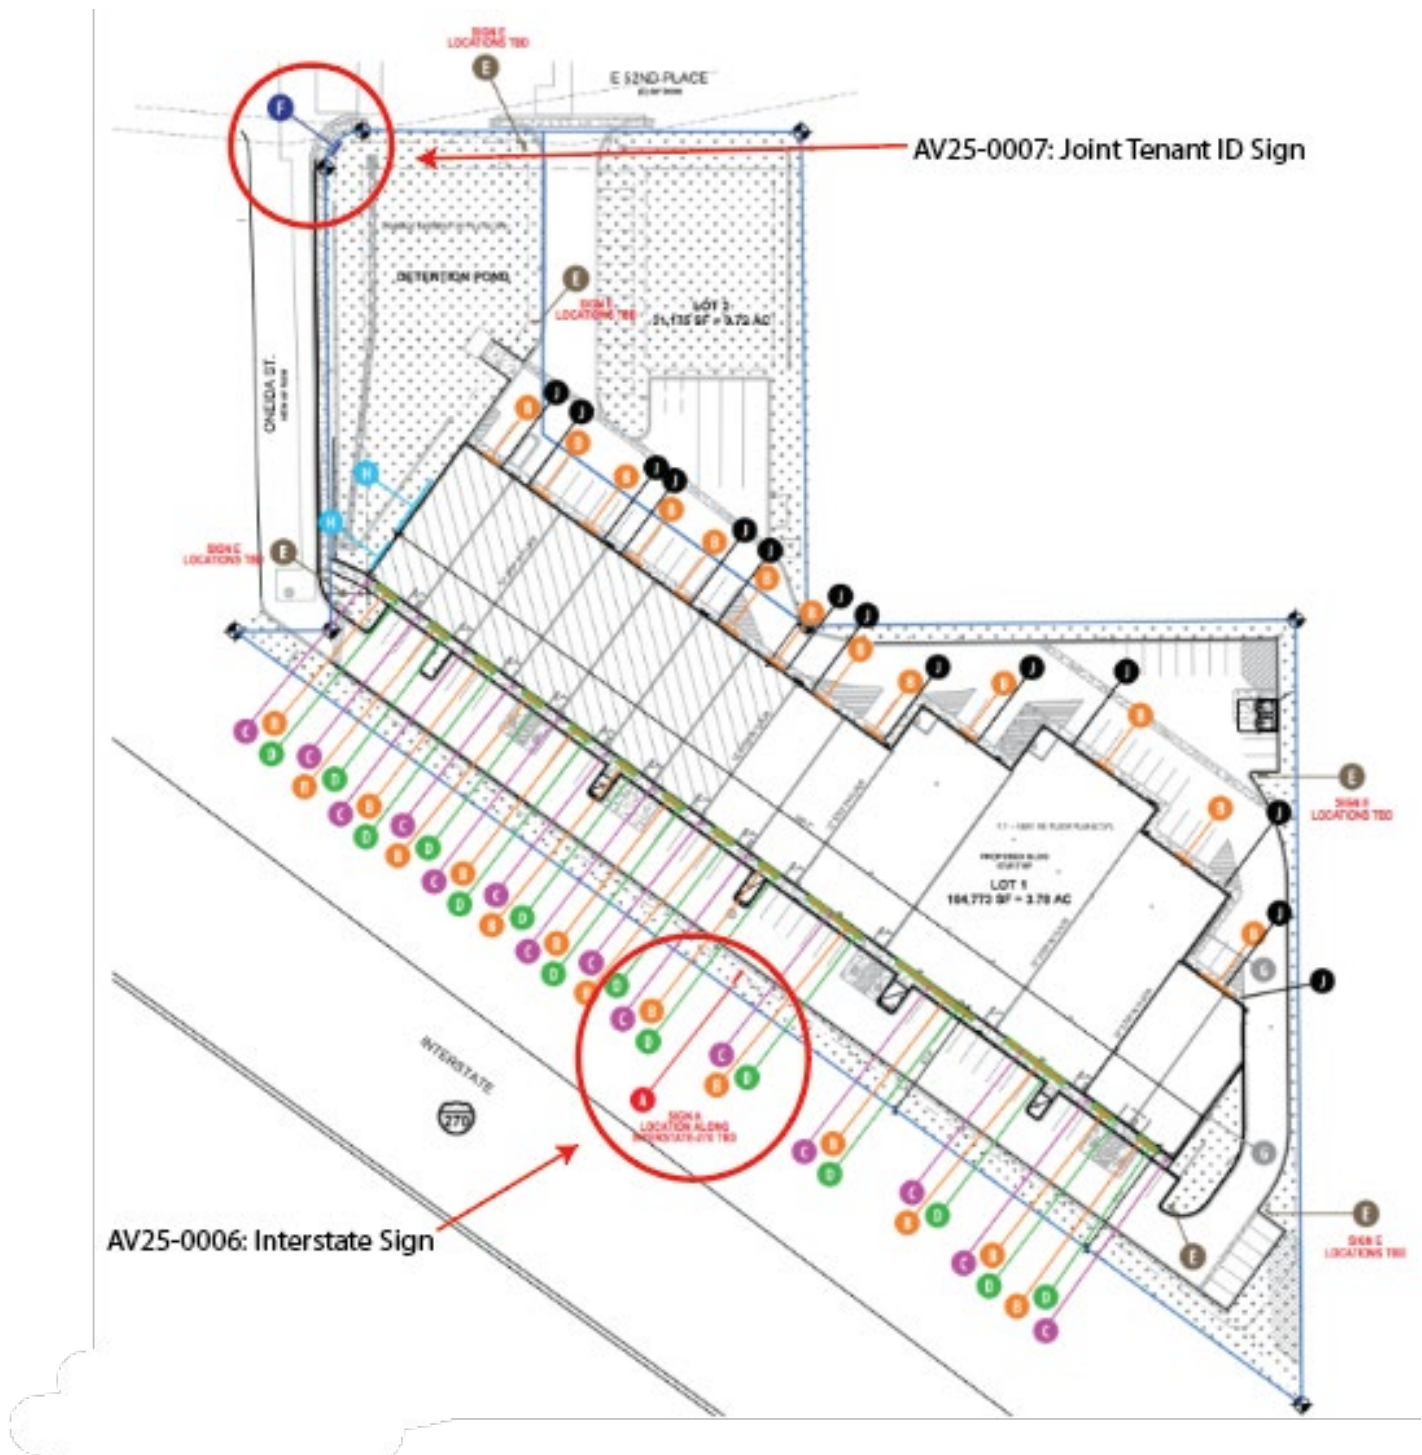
Proposed Joint Tenant ID Sign (AV25-0007)
